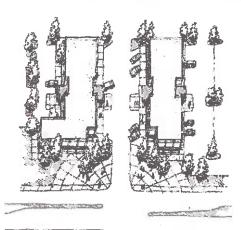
Retail buildings create a facing commercial frontage and provide visual access from the adjacent neighborhood.
